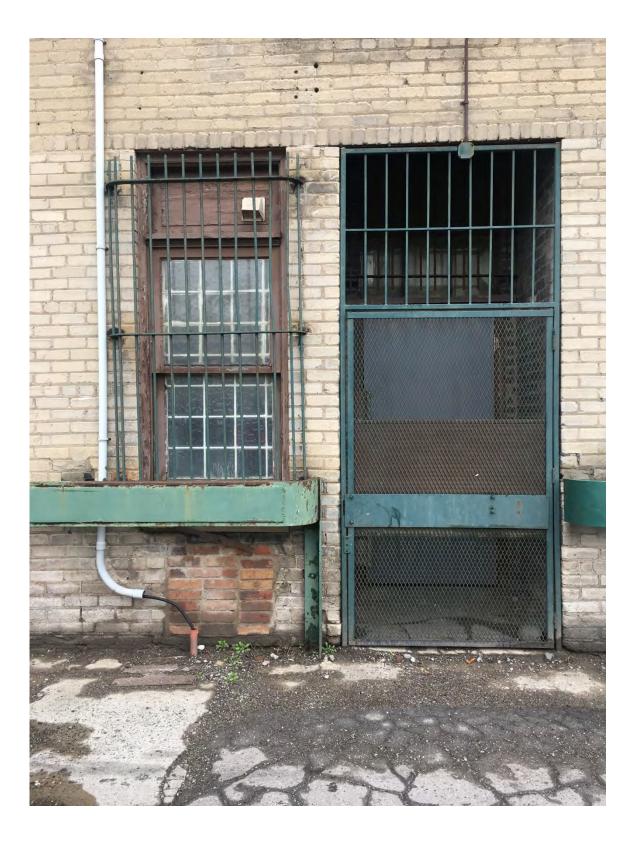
Exterior, North Façade, Looking South. 5/1/2019
